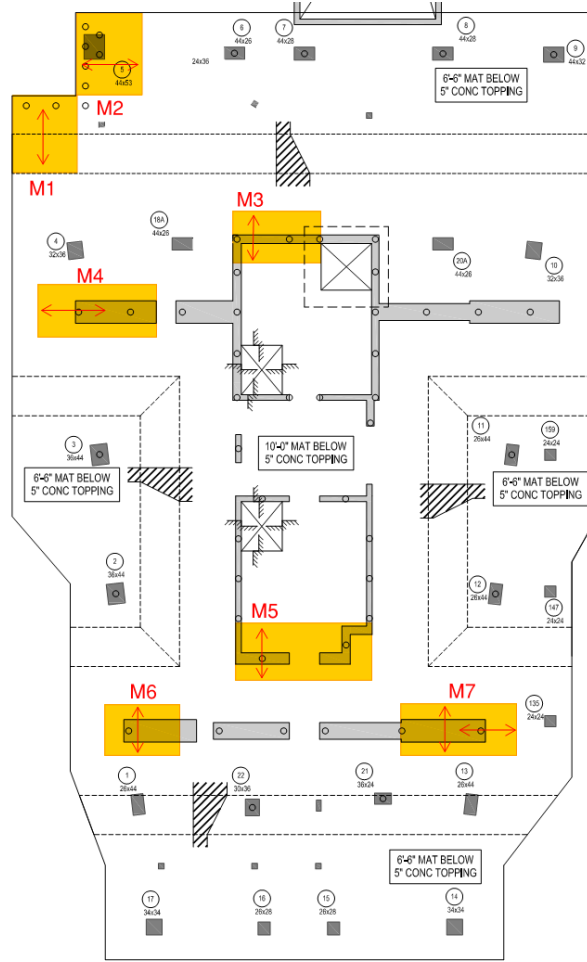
Location of Mat Foundation Reinforcement Checks (from FO-100.00)
